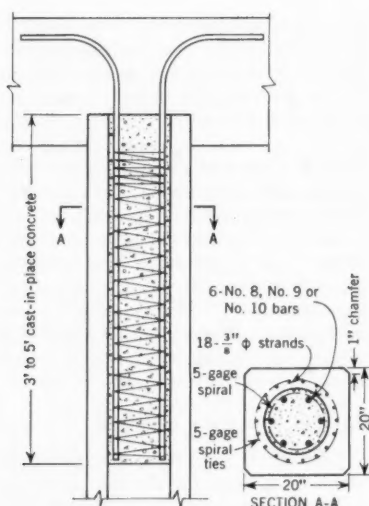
Holes drilled or formed 3/4 in. or 1 in. larger than dowels, by light-weight tubing (without bond breaker or lubricant), provide adequate bond for reinforcing when carefully grouted. Section A-A shows method of ensuring load transfer for piles with 3/8-in. strand.
